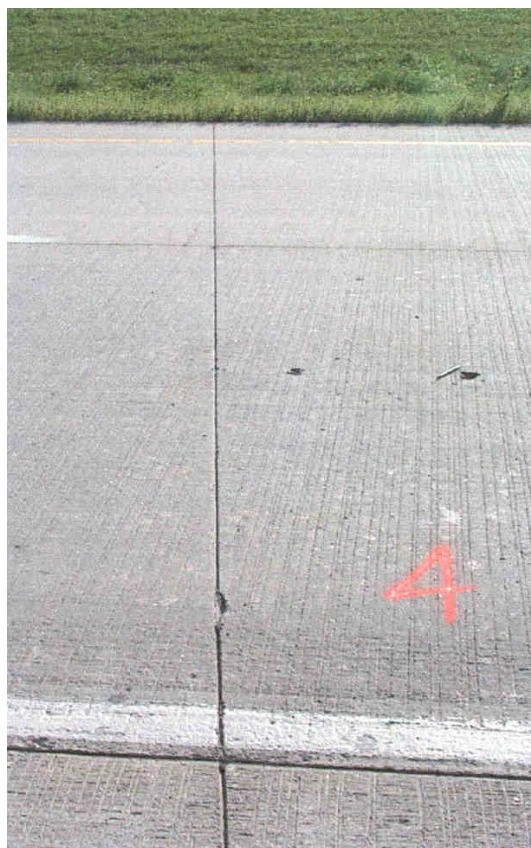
Typical transverse joint spalling and a larger pop-out.
